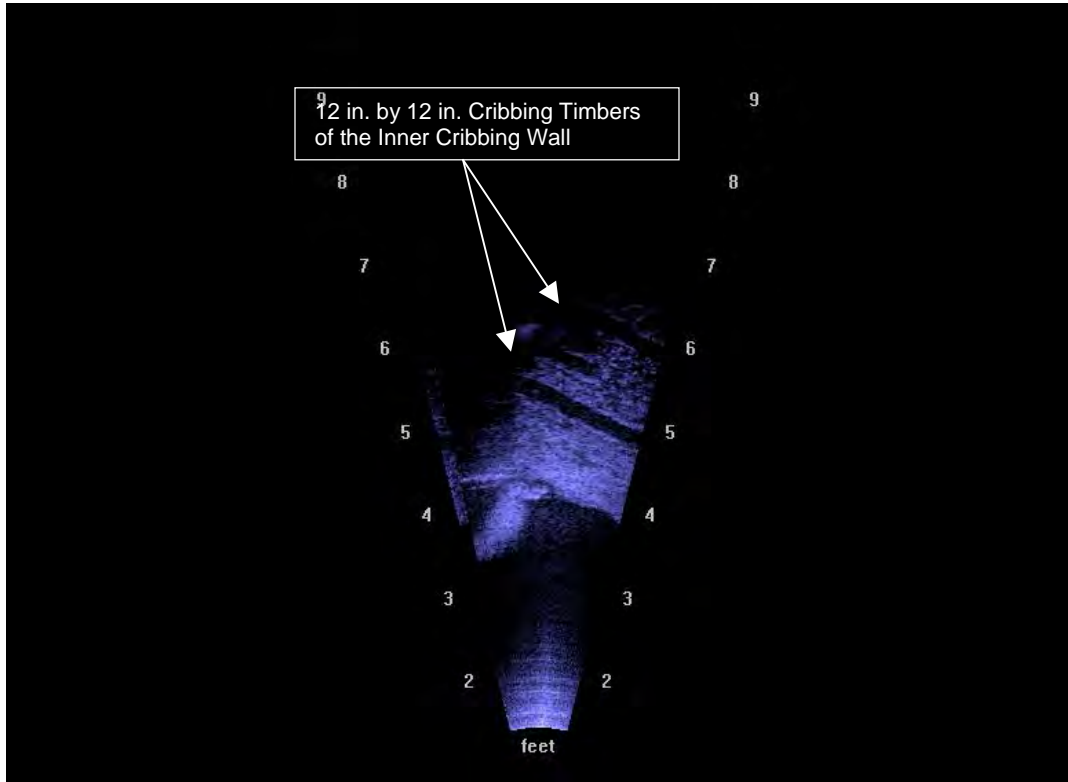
Sonar image from interior of void showing inner wall timbers in place.
